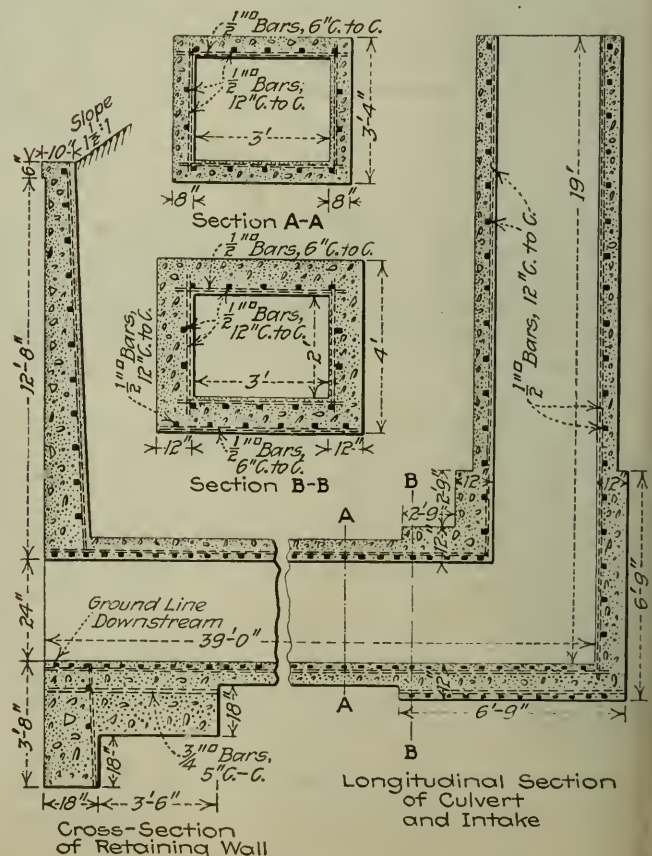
TYPE OF CULVERT TO BE USED AT SITE SHOWN IN FIG. 2
